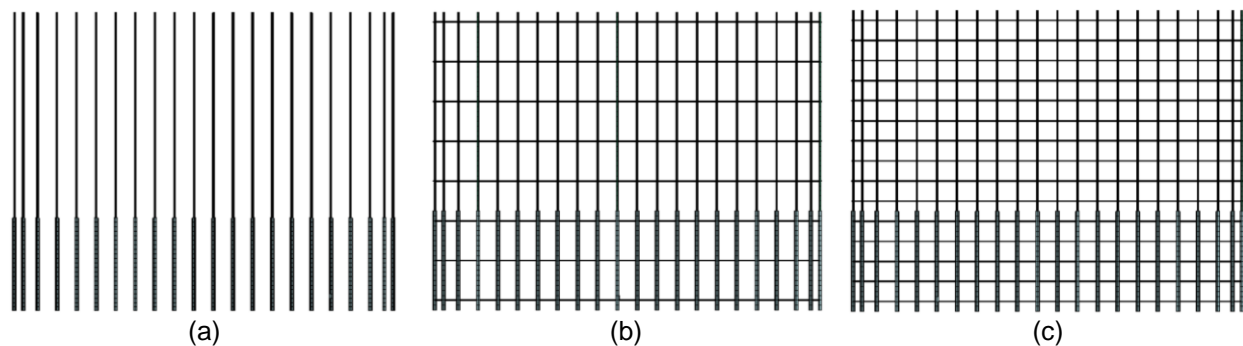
Longitudinal reinforcing steel bar and ties in T-pier: (a) no ties, (b) 24-in. tie spacing, and (c) 12-in. tie spacing
